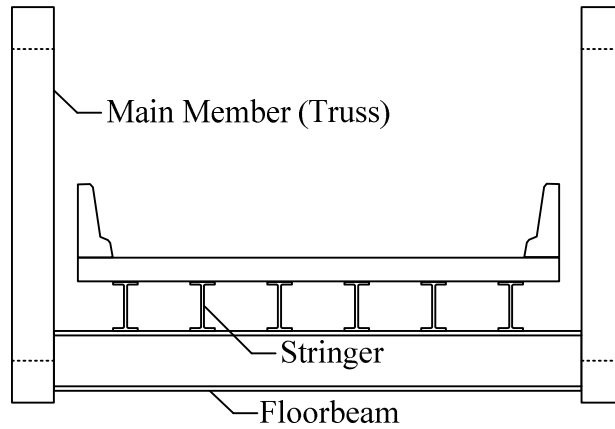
TRUSS-FLOORBEAM-STRINGER SYSTEM (THROUGH)
